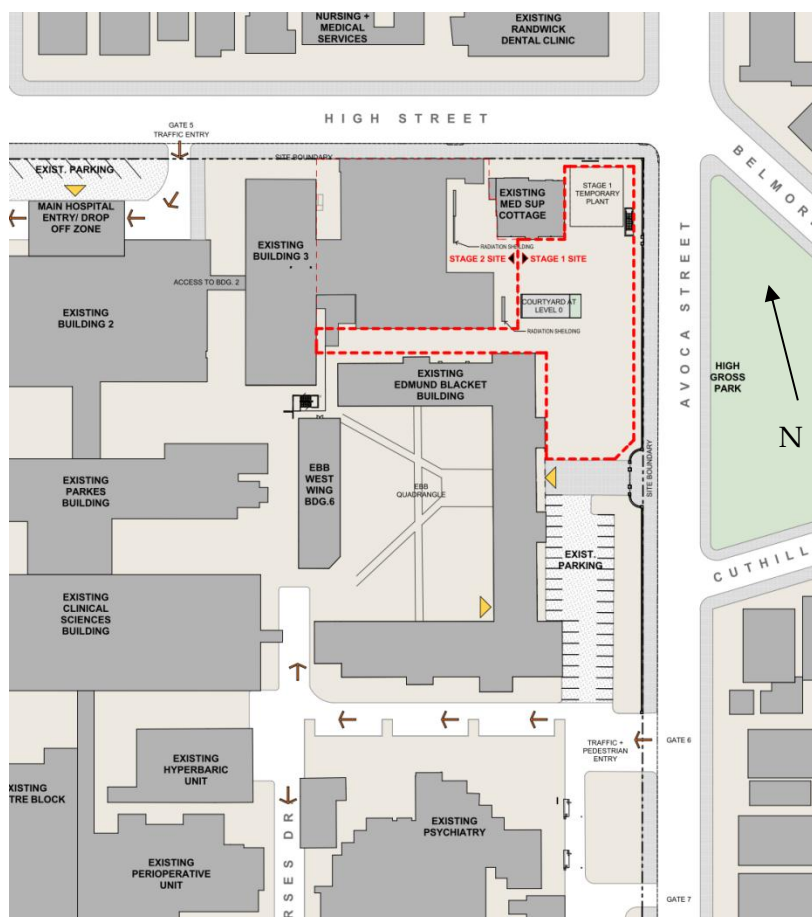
Site plan of the proposed Stage 2 development and surrounding existing developments
